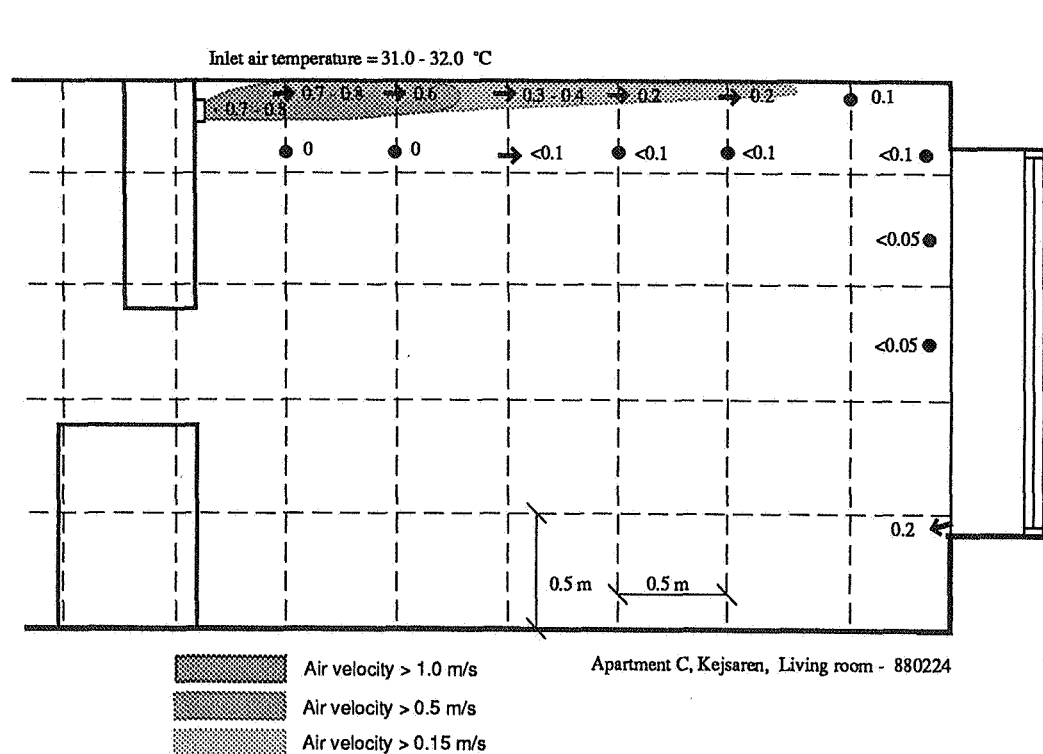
Section through a sittingroom with interior wall supply, apartment C, Kejsaren.
